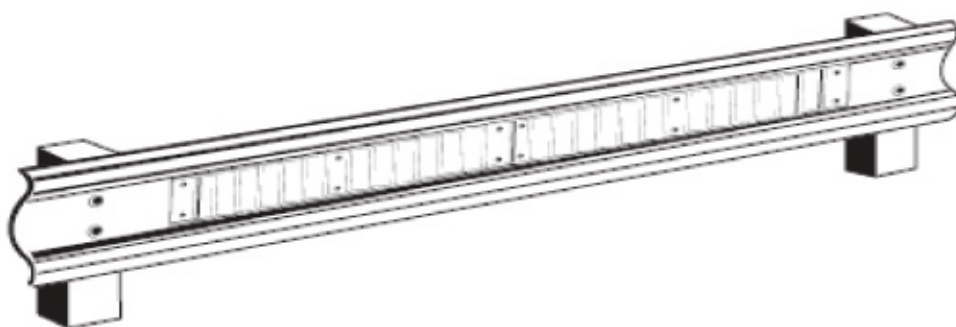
D: INSTALLATION – METAL GUARDRAILS
